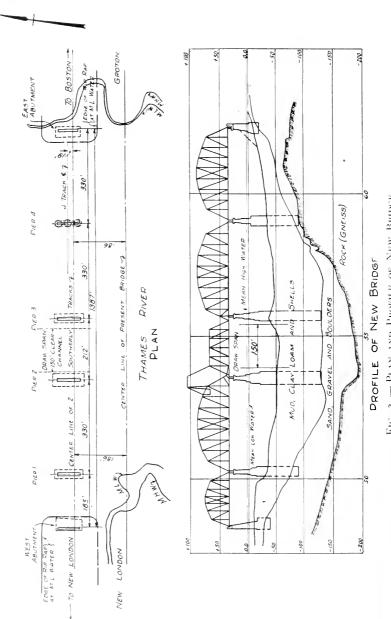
, — PLAN AND PROFILE OF NEW BRIDGE,
